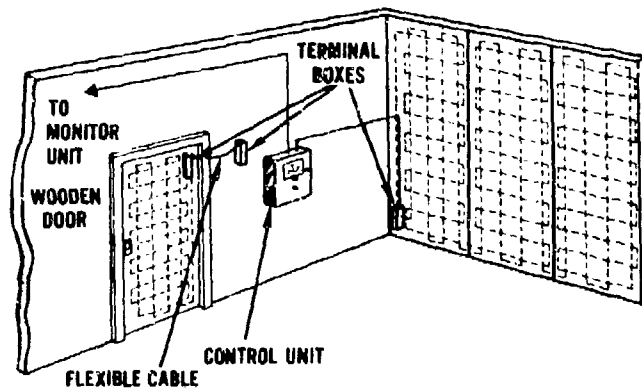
Grid Wire Sensor--Solid Wall, Floor, Ceiling Sensors
